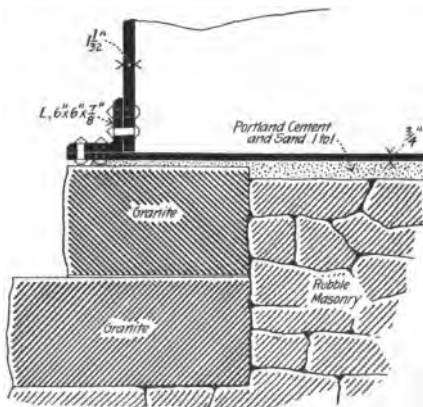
SECTION SHOWING BOTTOM OF EAST PROVIDENCE STAND-PIPE AND TOP OF FOUNDATION.
